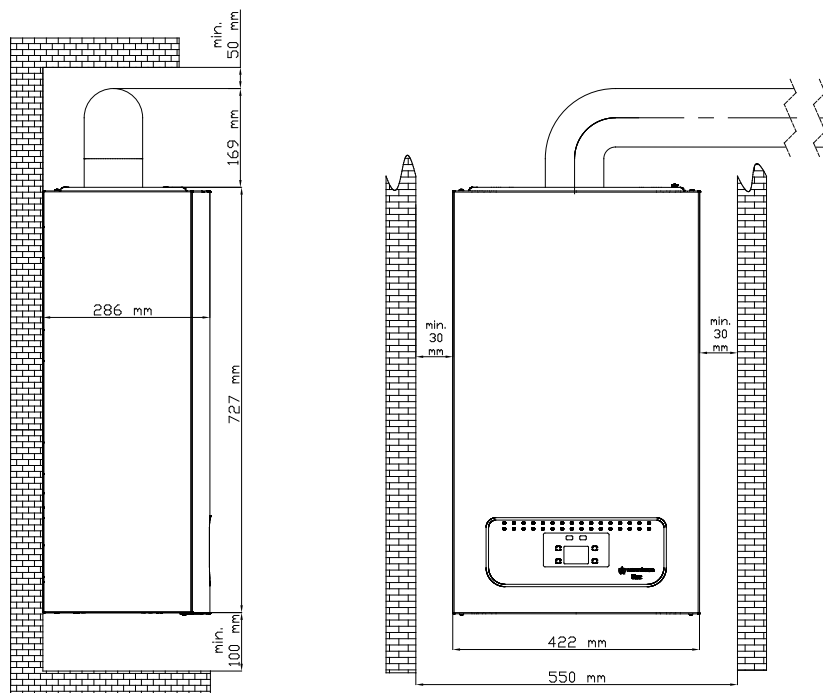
Boiler minimum dimensions in the cabinet *Minimum clearances required for servicing
